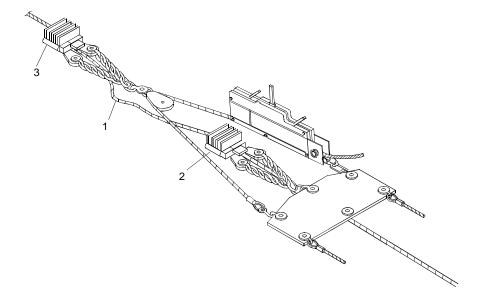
Using Griphoist to Relieve Mooring Cable Tension Between Carpenter Stops
